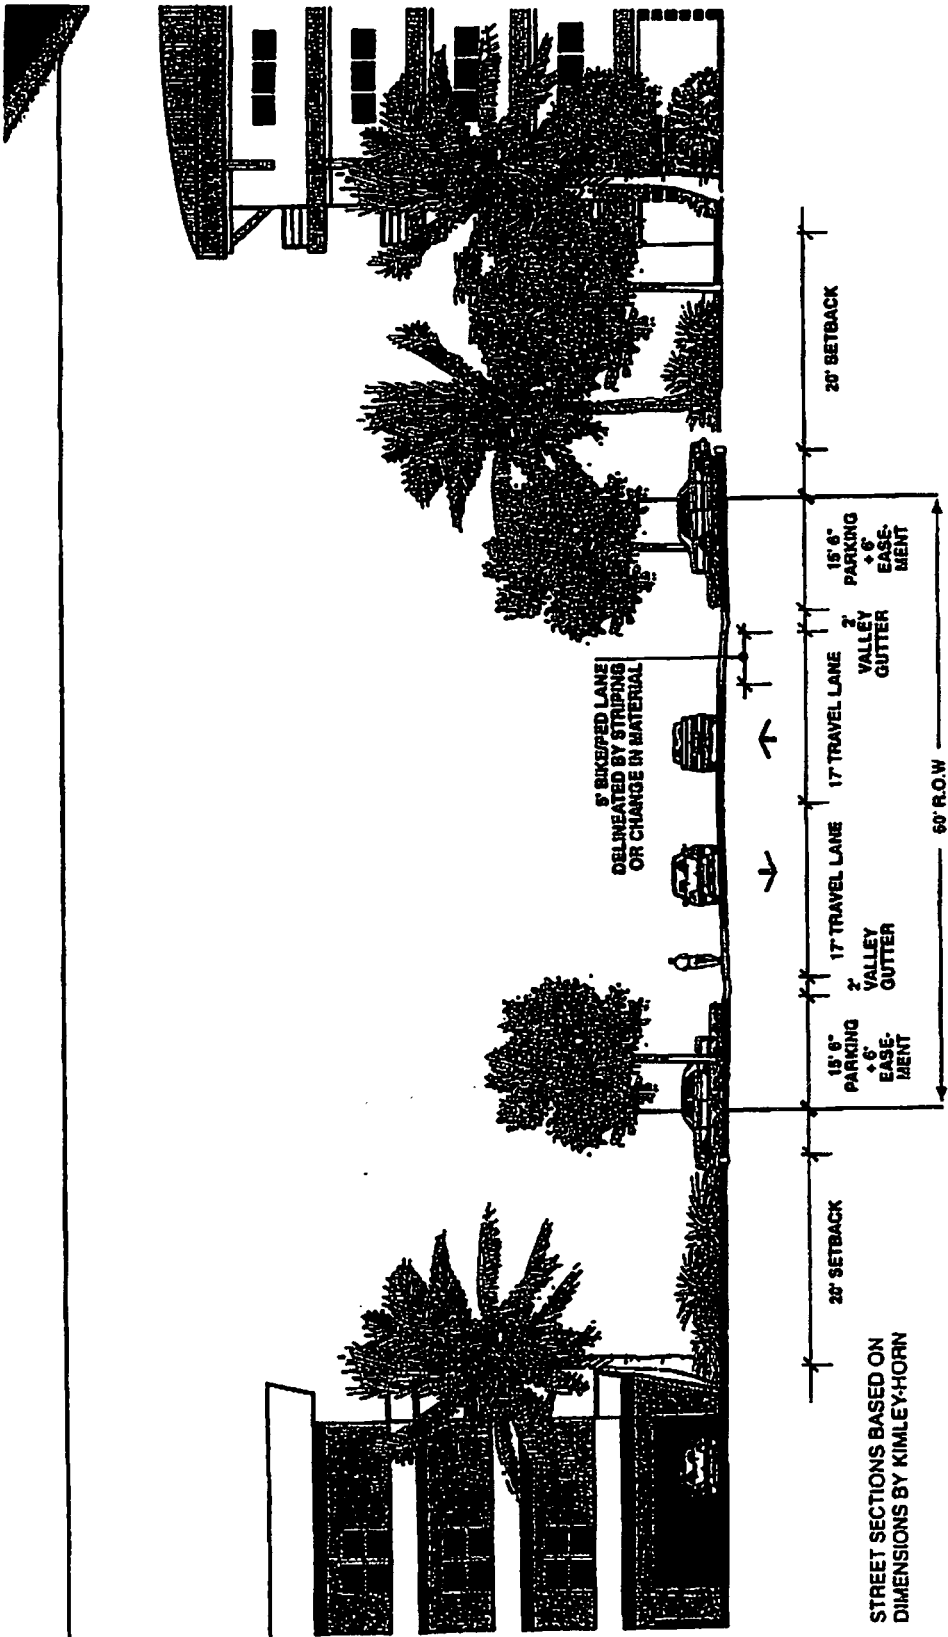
PREFERRED SECTION, INTERIOR ROAD, 3-5 STORY BUILDINGS, CURRENT SETBACK
